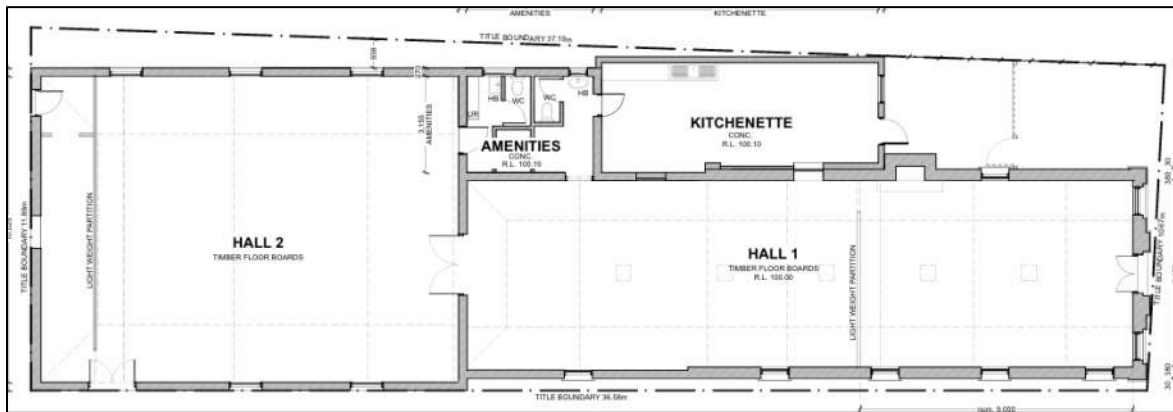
Existing floor plan (Source: DD+A proposal plan package)
